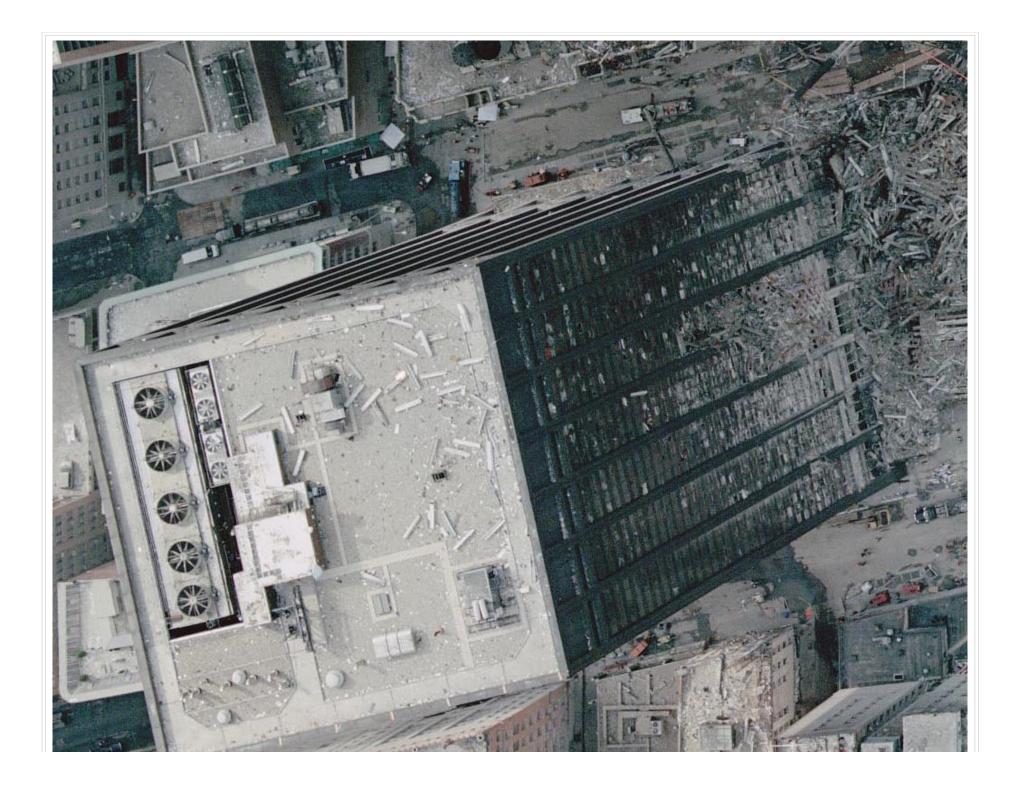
Banker's Trust, a 40-story building, had pulverized dust and some WTC aluminum cladding on its roof -- plus some damage mostly confined to its lower floors. This same pattern prevails in other damaged buildings adjacent to the WTC complex. (See Figure 9, below.) This is surprisingly little damage following destruction of 110-story buildings directly across the street. Why is there no serious damage to the adjacent buildings above the 20th floors of those buildings? Such damage is less than 20% of the height of a Twin Tower. What would explain why this? Disintegration and pulverization into talcumpowder-sized dust above the 20th floors would explain this. (9/23/01) Source: USGS/NOAA
